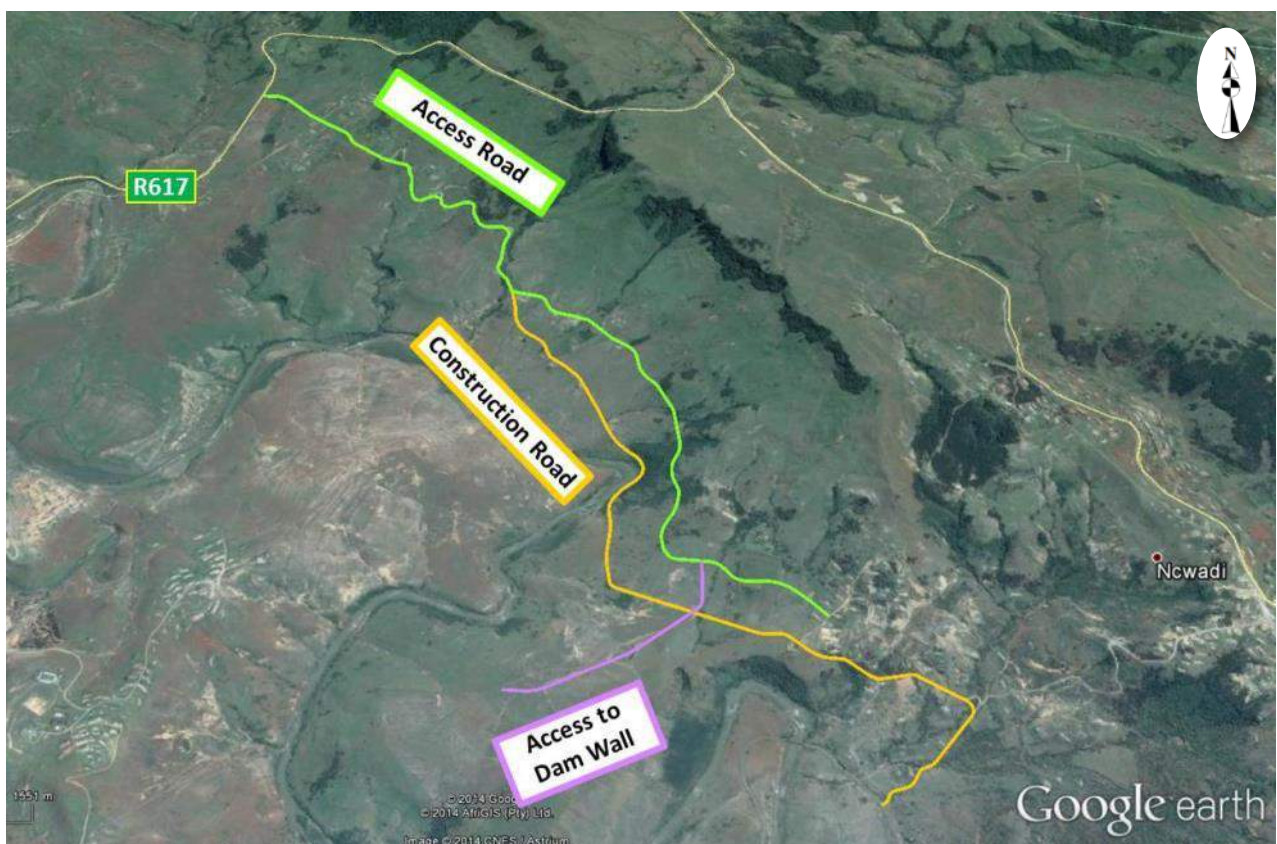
Smithfield Dam – access road, construction road and access to dam wall
